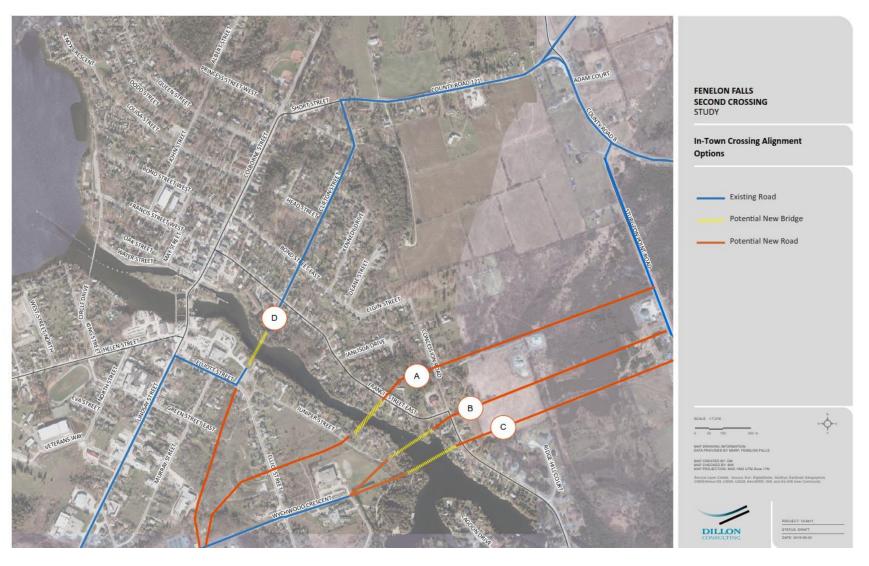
In-Town Second Bridge Crossing, Preliminary Alignment Options
